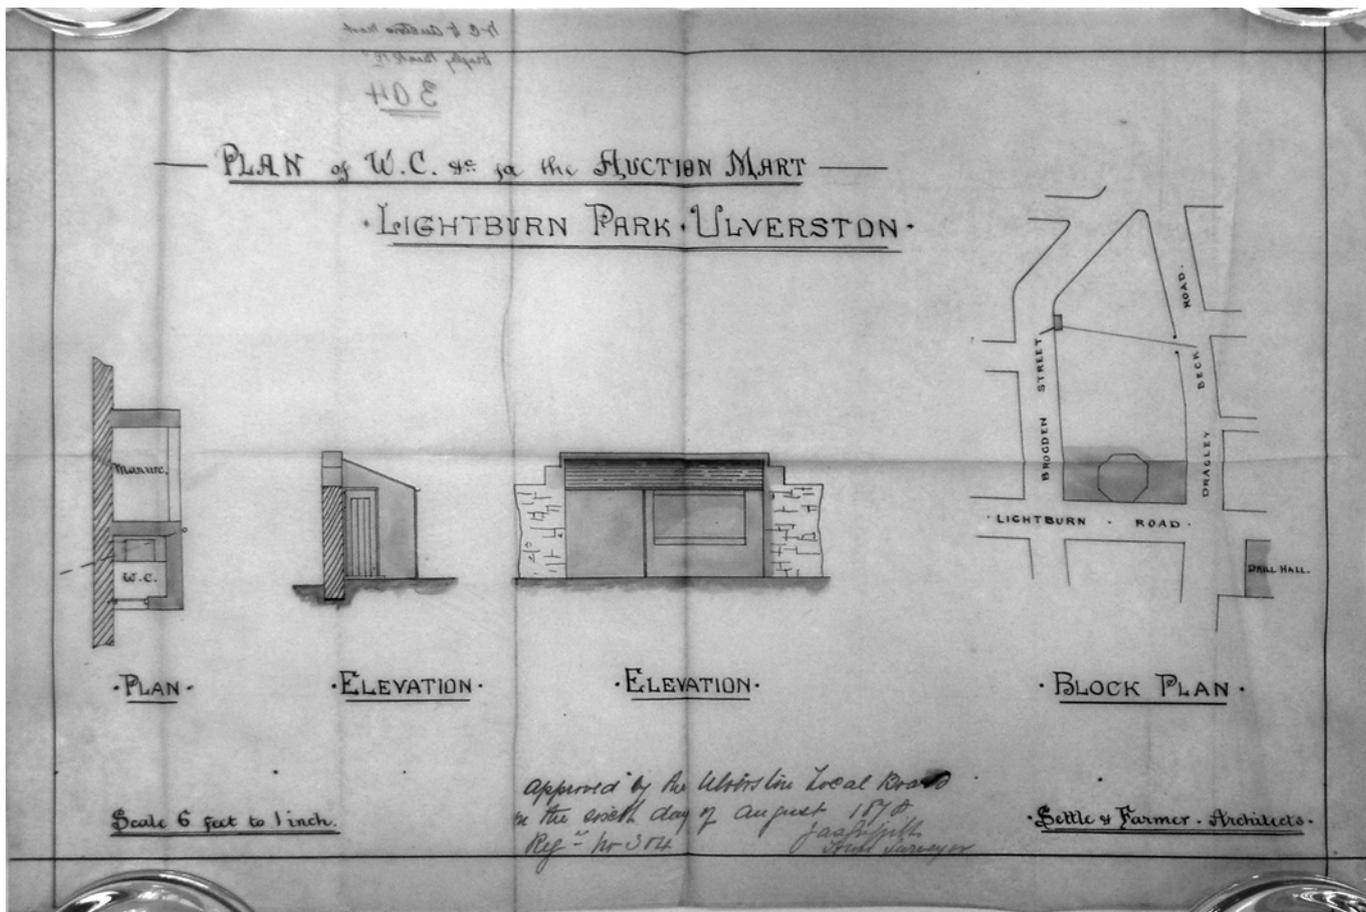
Plan of water closet and middenstead for the Auction Mart, 1878
